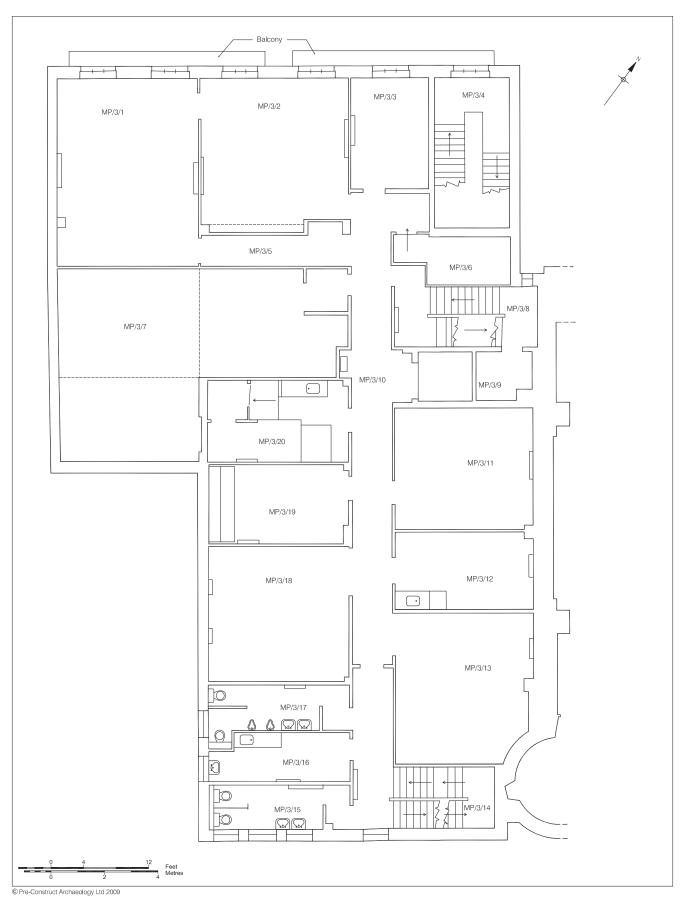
Second Floor Plan 1-2 Montague Place British Museum 1:100 at A3
